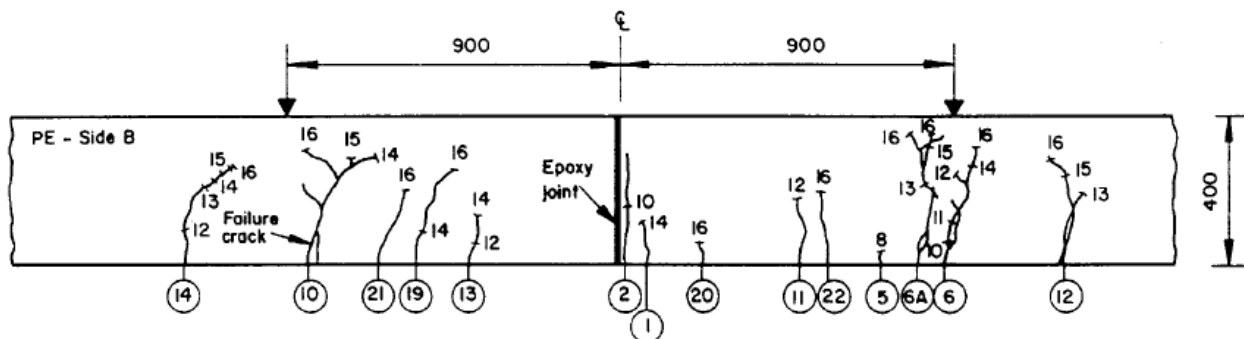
Cracking pattern in the epoxy-jointed pile (Navaratnarajah 1981) - dimensions all in mm (25.4 mm = 1 in.)
